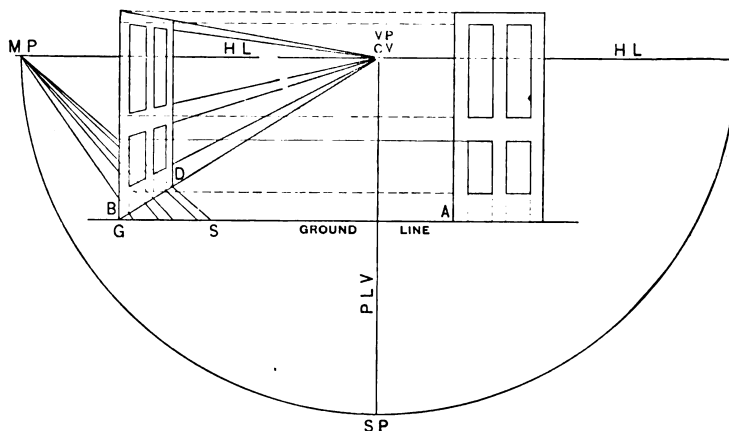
Geometrical Drawing and Perspective of a Door.—Scale, 3-16 Inch to the Foot.
